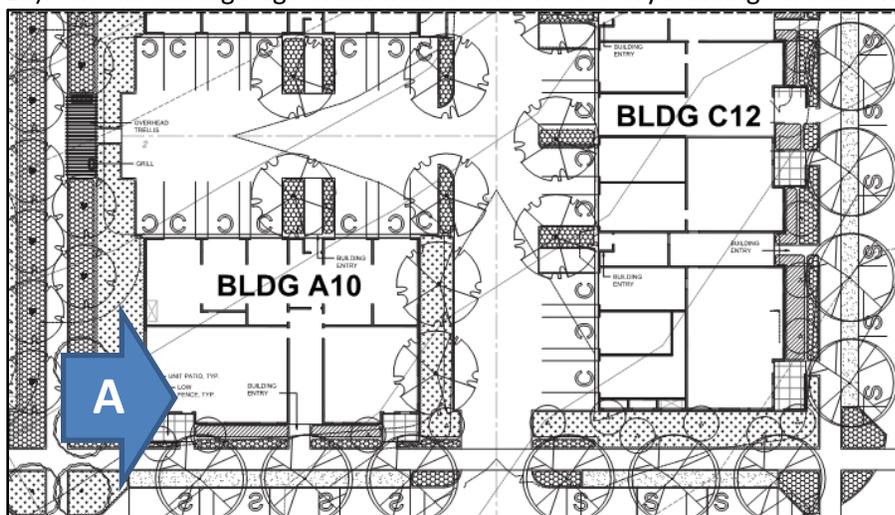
Blank walls along the side of the buildings adjacent to Community Spaces (A) and Circulation Facilities (B)
